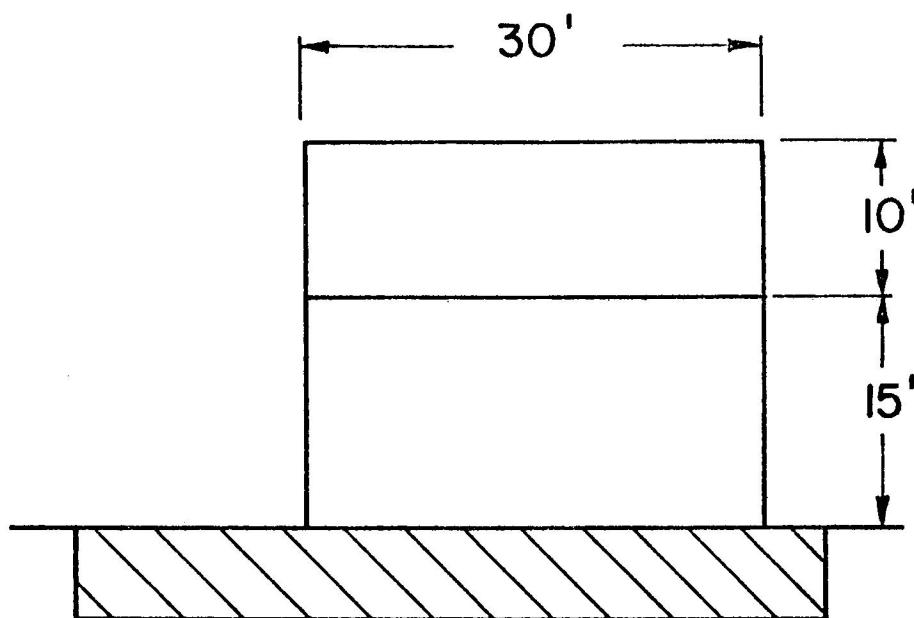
Elevation of 2-Story Building Frame Showing Rigid Base
